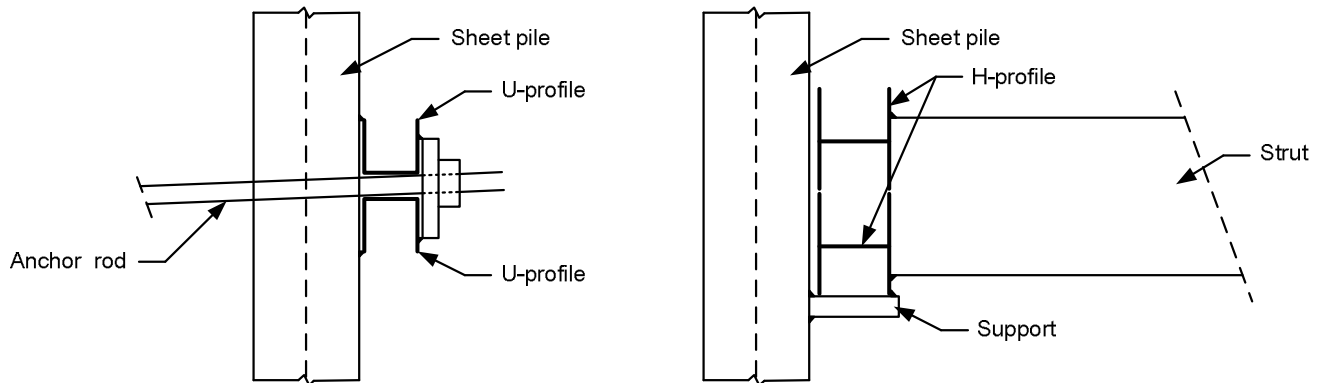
wales supported by anchors (left) and wales supported by struts (right).
